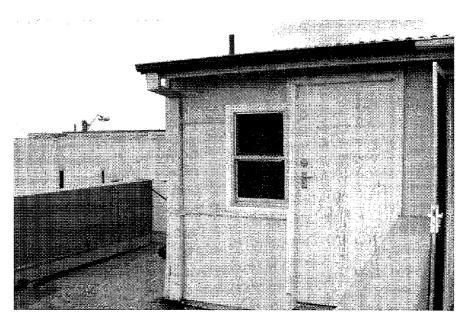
Example of asbestos cement sheeting located on the external wall cladding of the roof top laundry's of residential tenancies at 91A-B Liverpool Road.
